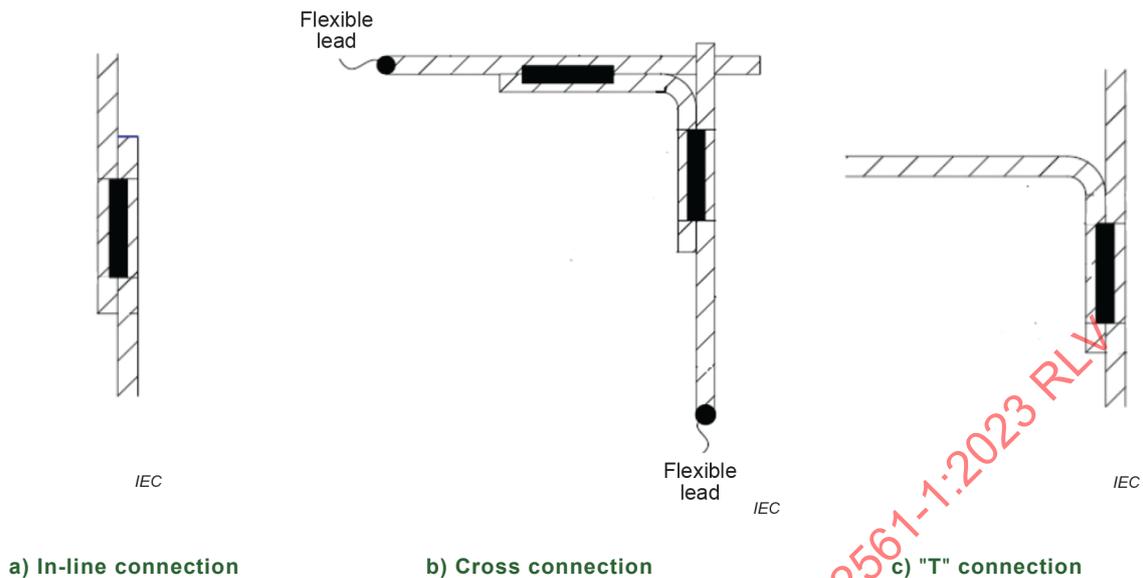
Basic arrangement of specimen with welded, brazed or exothermic connections of reinforcing rods
